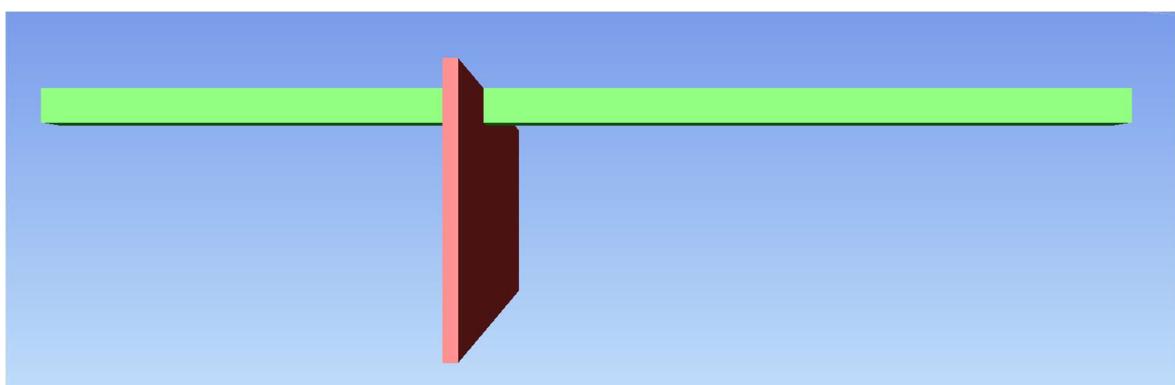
High Clash of Architectural wall (Element ID 2193) vs Structural beam (Element ID 166402) – Back Side View
